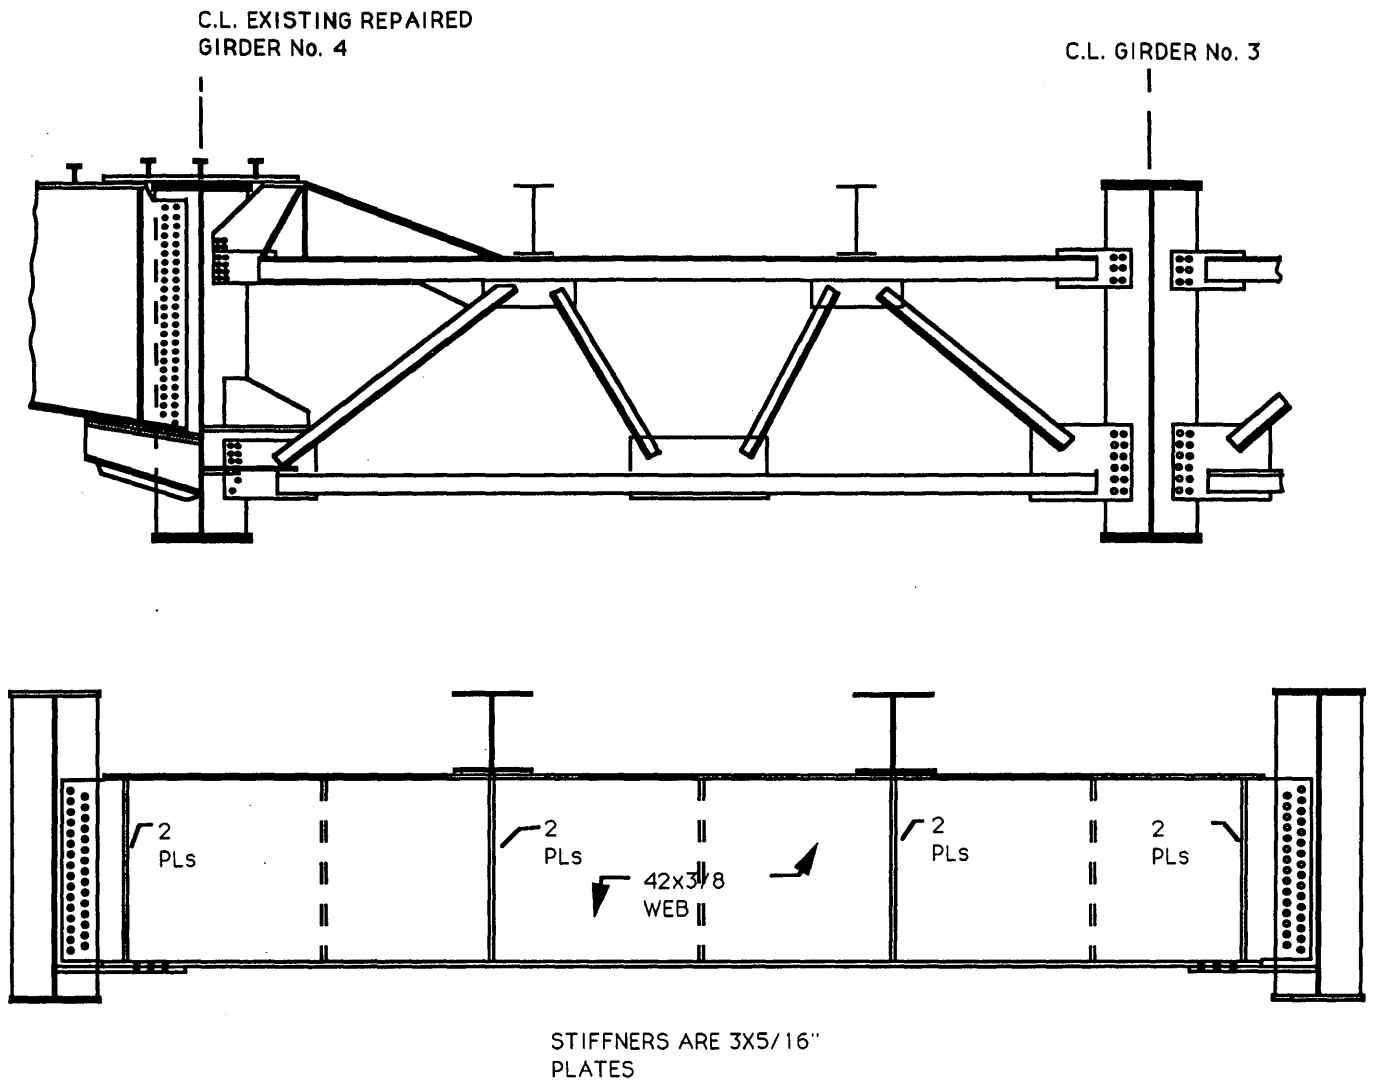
Top, typical floor truss; bottom, typical transverse floor girder.
